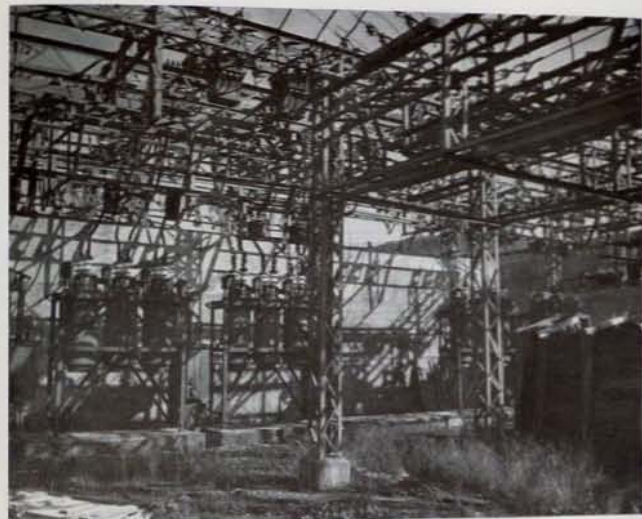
5,200 feet from GZ. Blast walls and 3.5-kilovolt circuit breakers west of power transformer bank, Urakami Substation.
